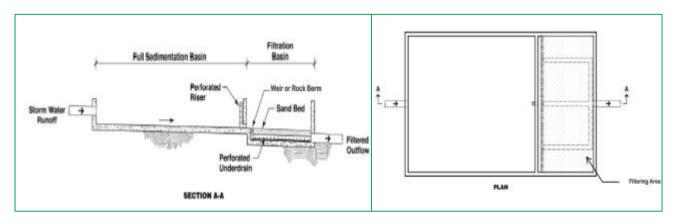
SAND FILTER DESIGN SECTION (LEFT) AND PLAN VIEW (RIGHT)
